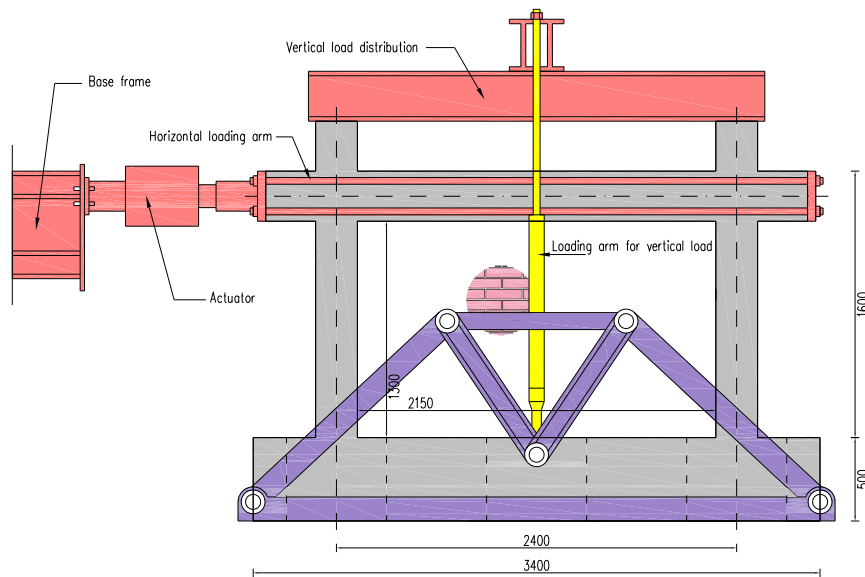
Test Set-up and Loading Arrangement (unit: mm)
